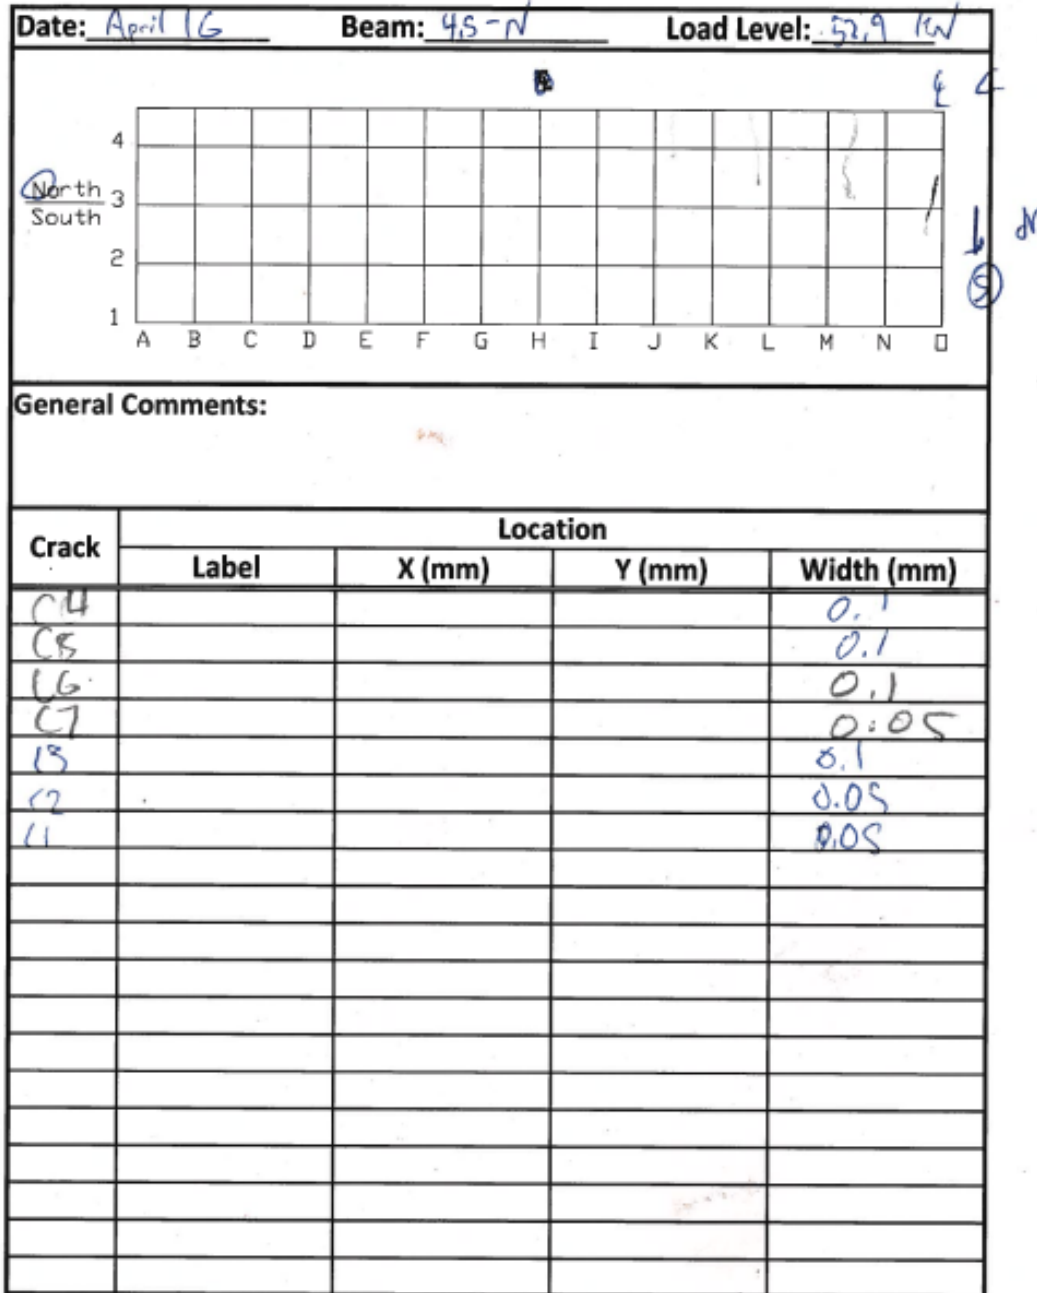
Crack tracking of north side of BM 4.5-N at 52.9 kN
